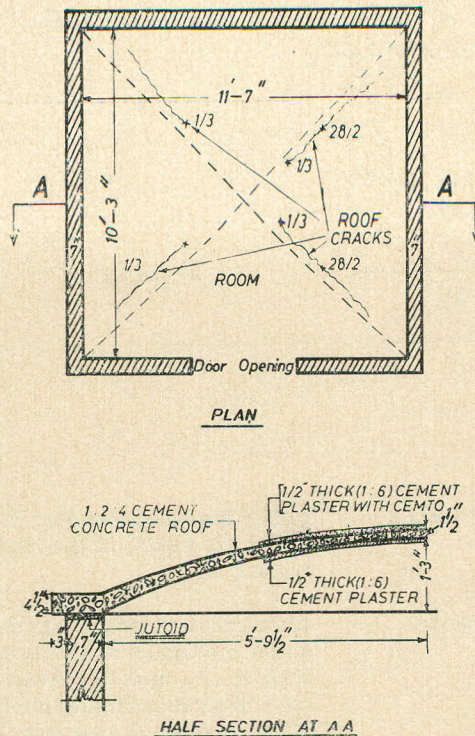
The construction and testing details of a room with vault roof of varying arch thickness. Test load: 270 lbs./sq. ft. on the curved surface of the roof.
